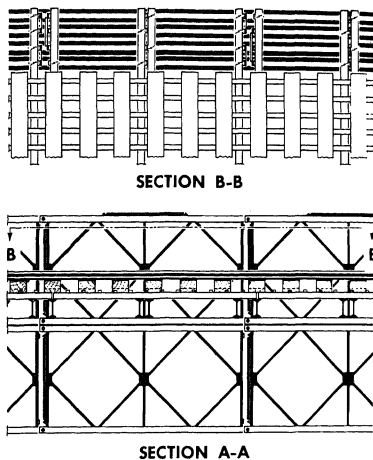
Decking of through-type panel railway bridge, using 14-foot ties.
